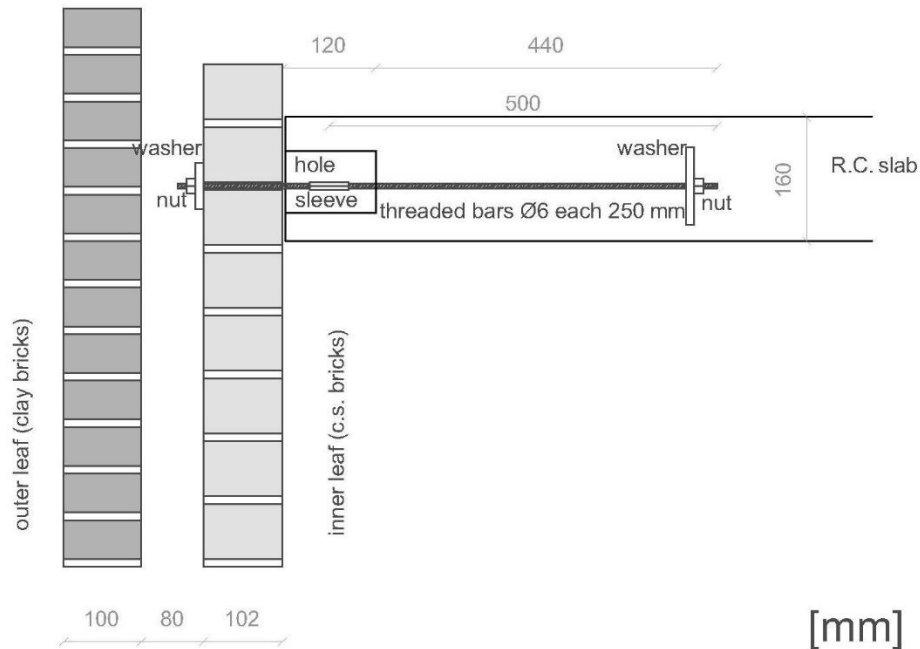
Detail of the connection between the r.c. slab of the first floor and the inner leaf (c.s. walls) - East and West side
